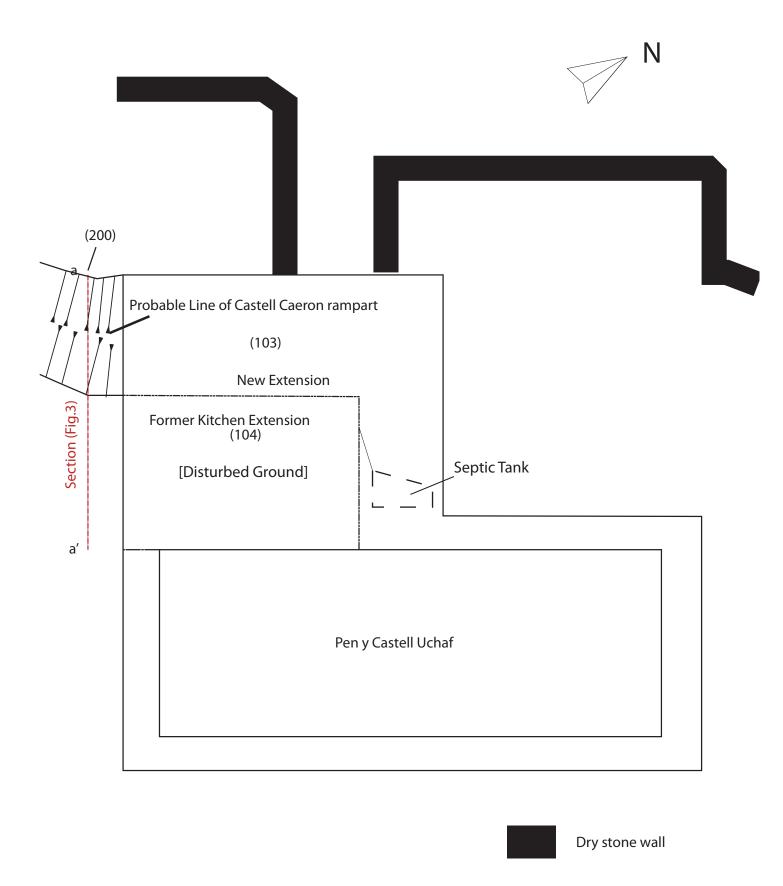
Plan of rear extention excavation at Pen y Castell Uchaf
